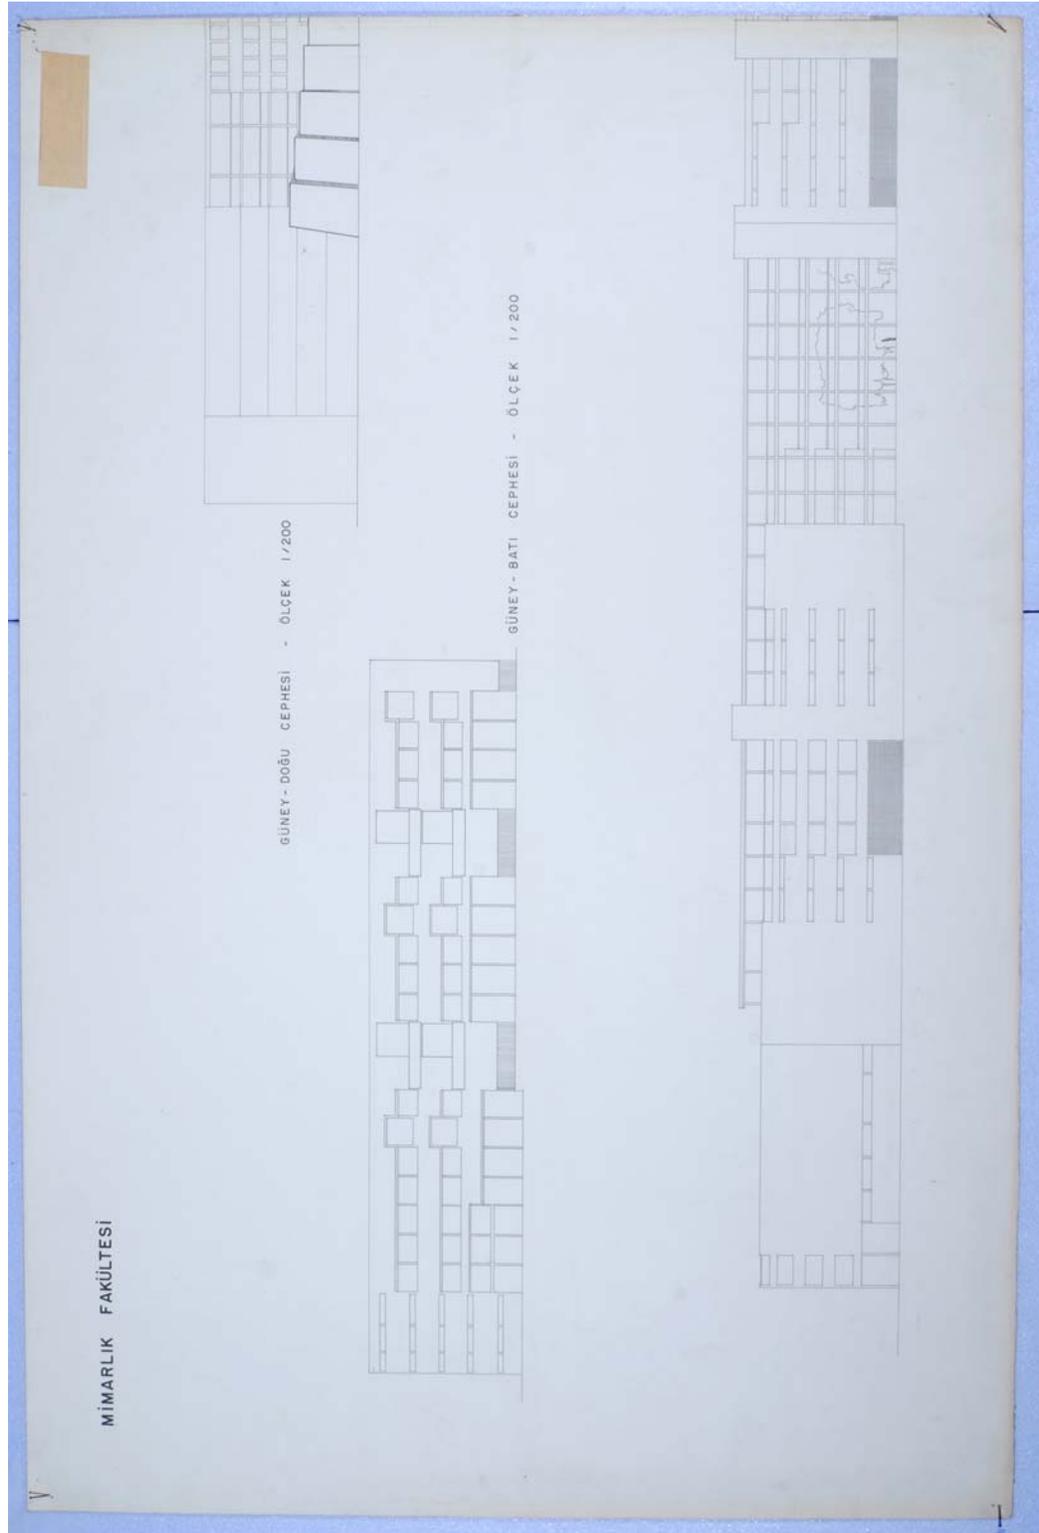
Partial elevations; School of Architecture building; Second Place Winner (project no. 18), Second Competition, Esat Turak, Gürol Gürkan, Önder Sonad, Aktan Yörükoğlu, Osman Armangil (Source: Çinici office archives).
